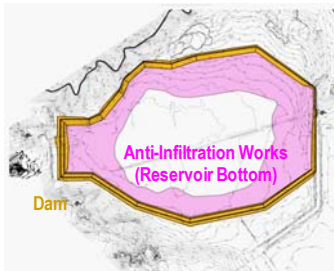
Plan and Typical Cross Section (Plan-B)
